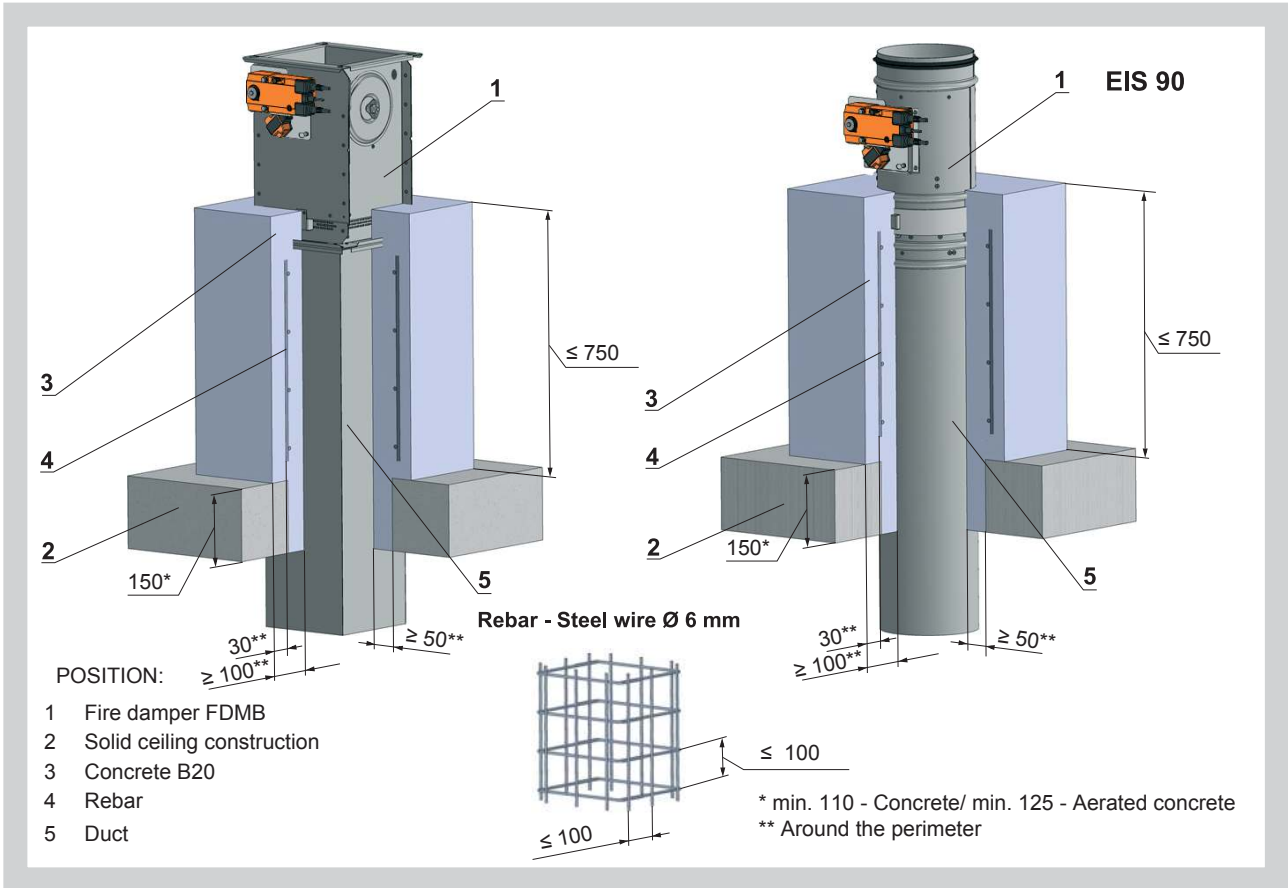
Installation outside of solid ceiling construction - concrete and installation frame
